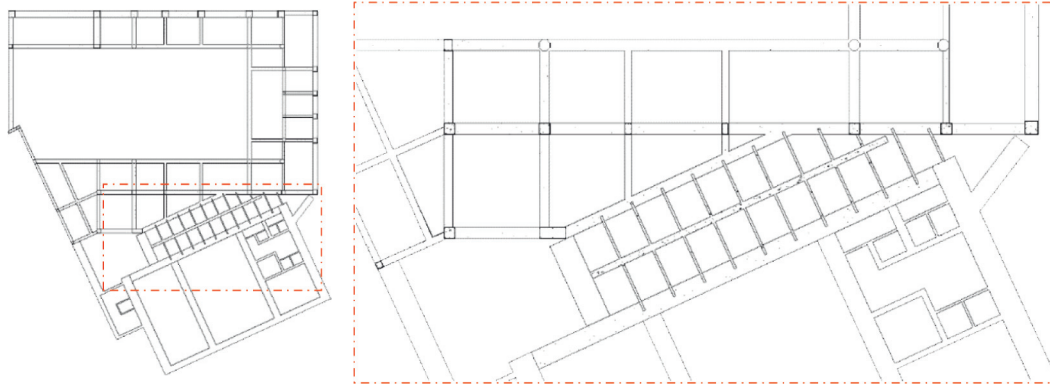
Detail of the connecting floor: identification (a) and zoom (b).
